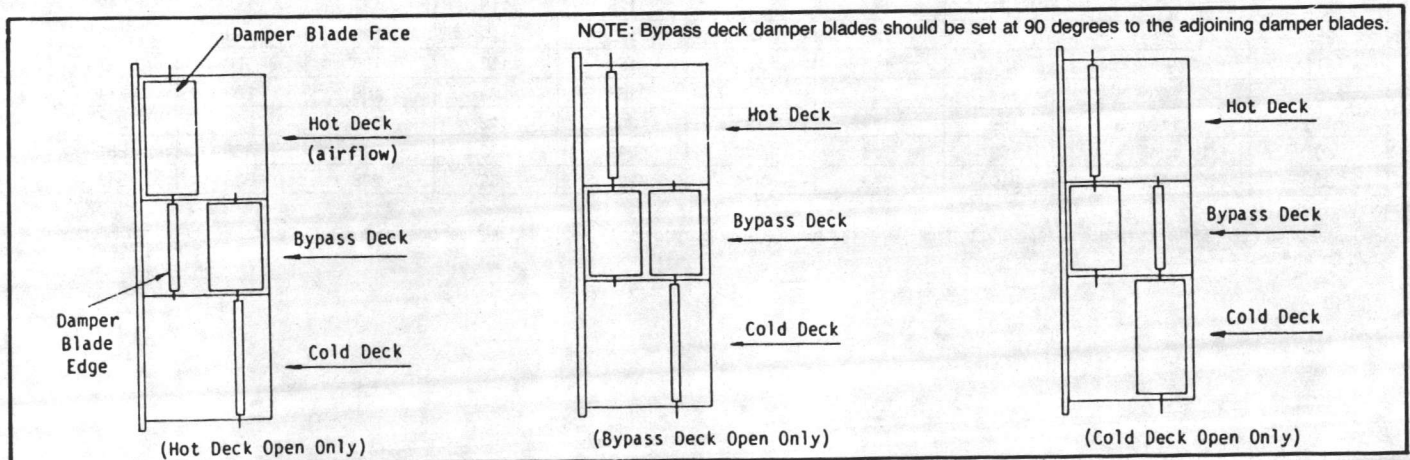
B - Proper Three-Deck Multizone Damper Blade Configuration
